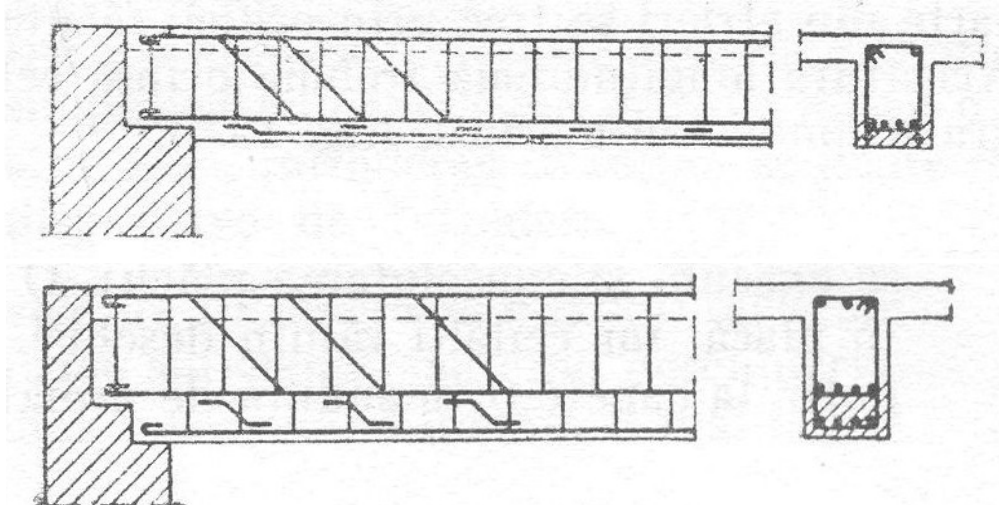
Strengthening by adding reinforced concrete at lower part
